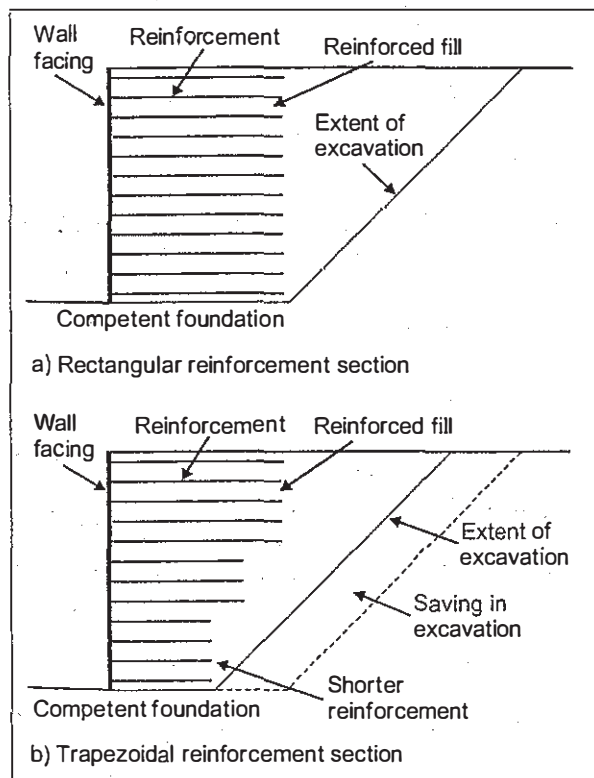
Trapezoidal-section wall showing economies compared to rectangular section wall.
